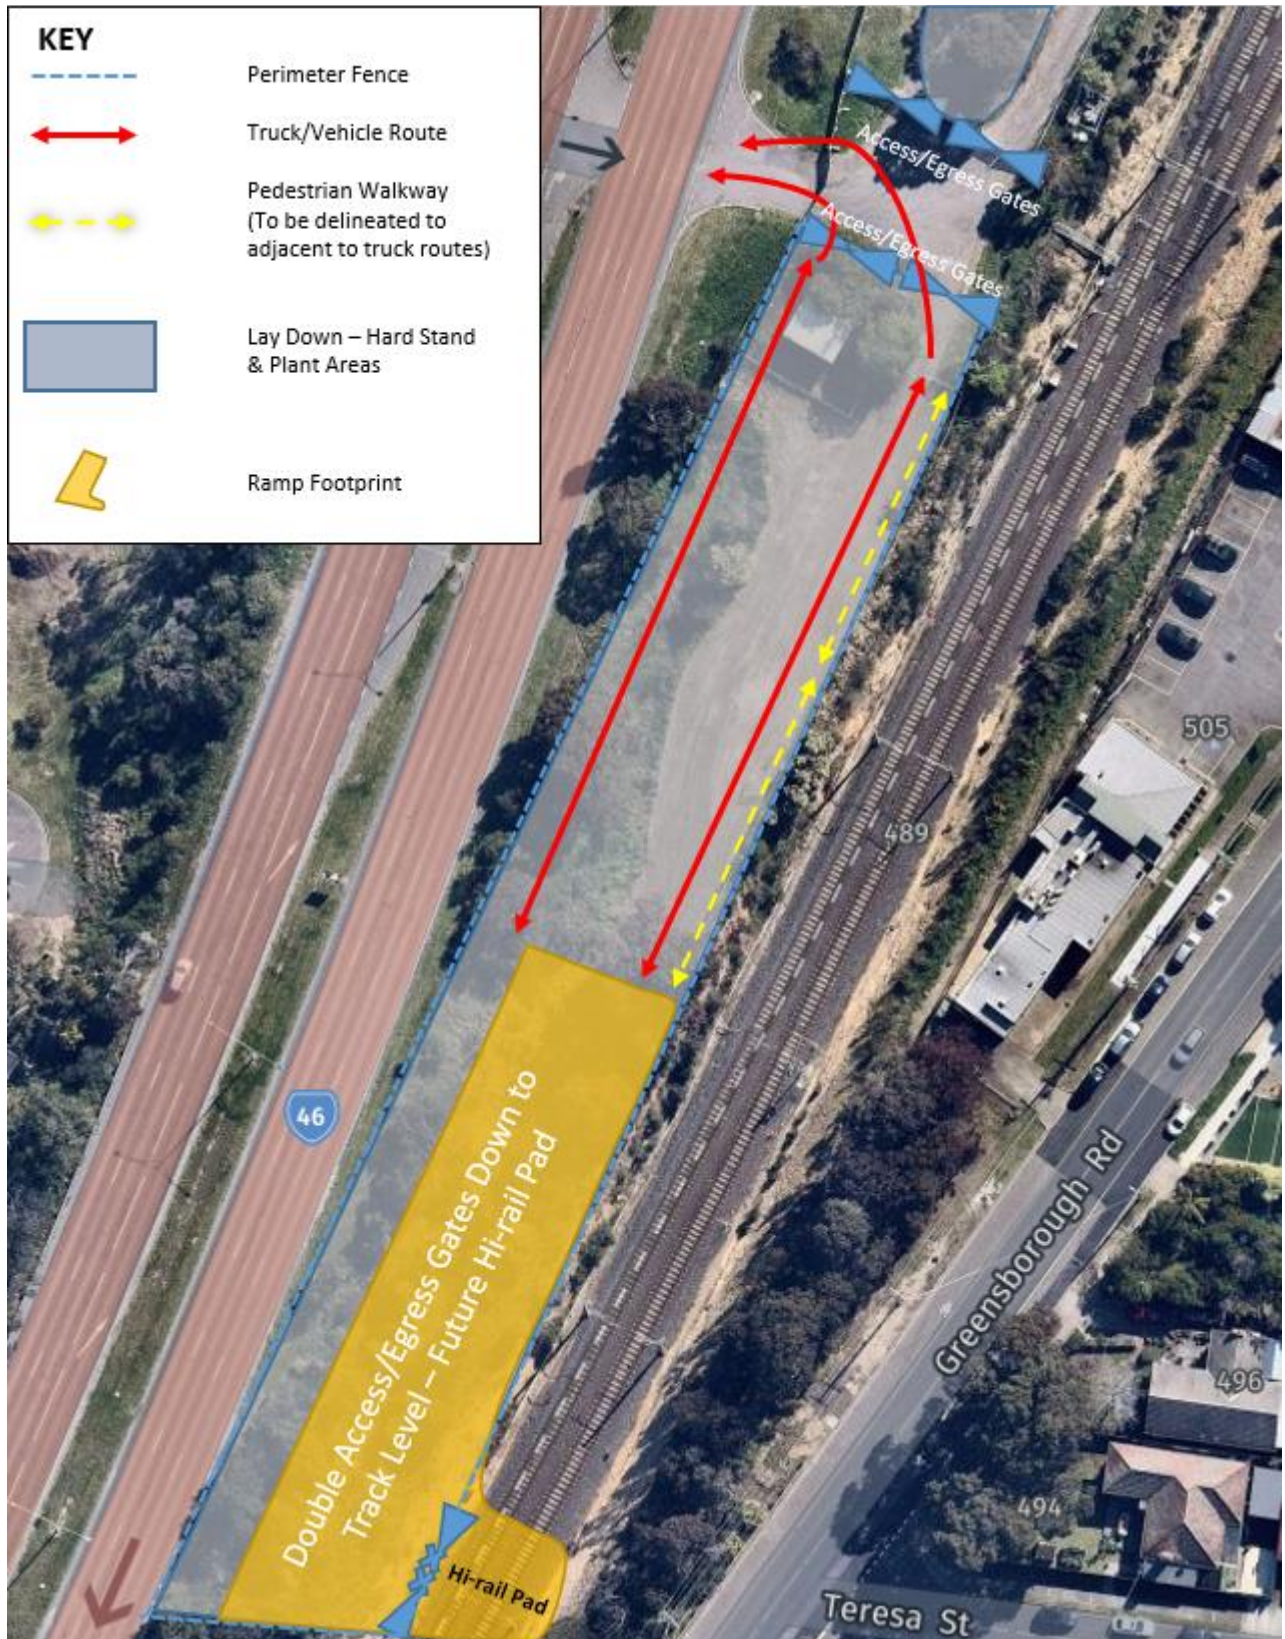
Grimshaw Street compound proposed Site Plan 2 of 2 (Southern end)
